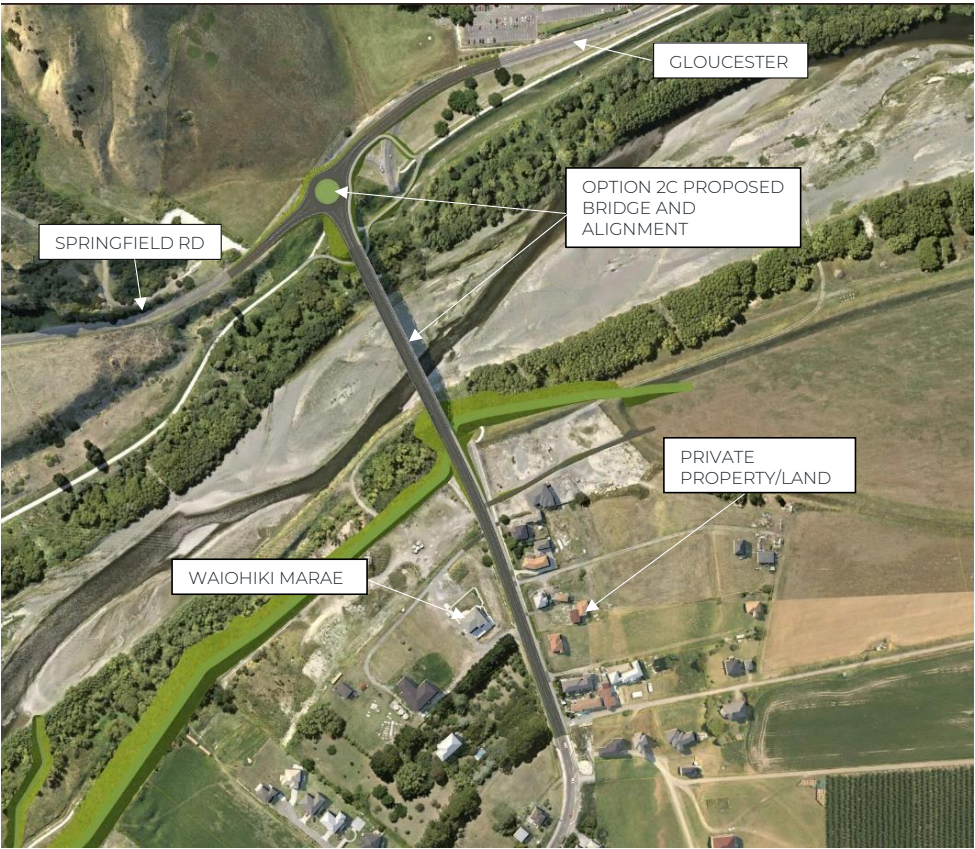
Option 2C: Replace Bridge Upstream of Existing Bridge with Improved Alignment
